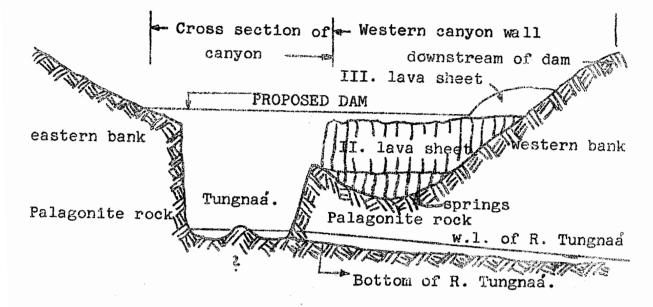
Upper dam site at Tungnaárkrókur and section through the canyon of R. Tungnaá, until downstream of the lower dam site, looking west.
